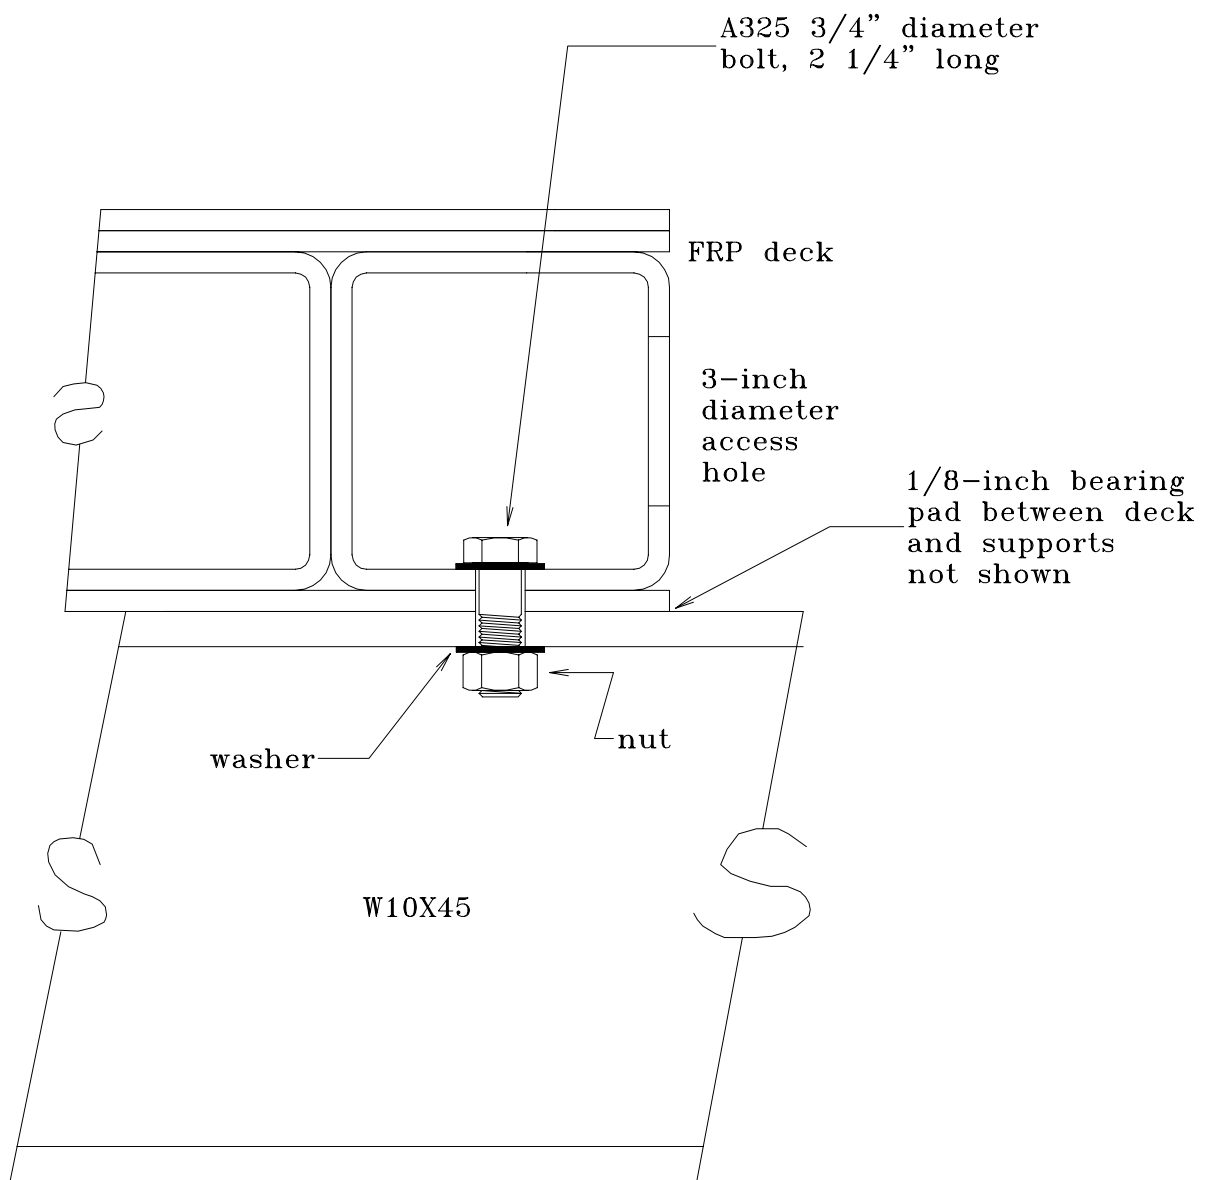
FRP Deck and steel access panels (weigh station test facility)
